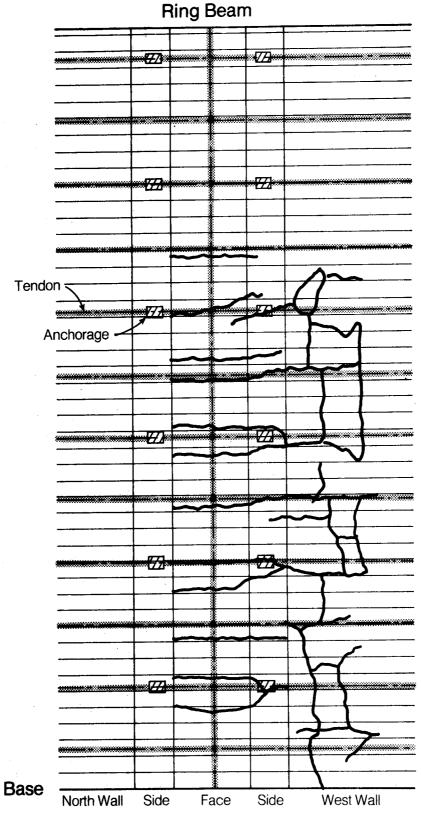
Developed View of North West Buttress showing Cracks at End of Test F, 80 psi
